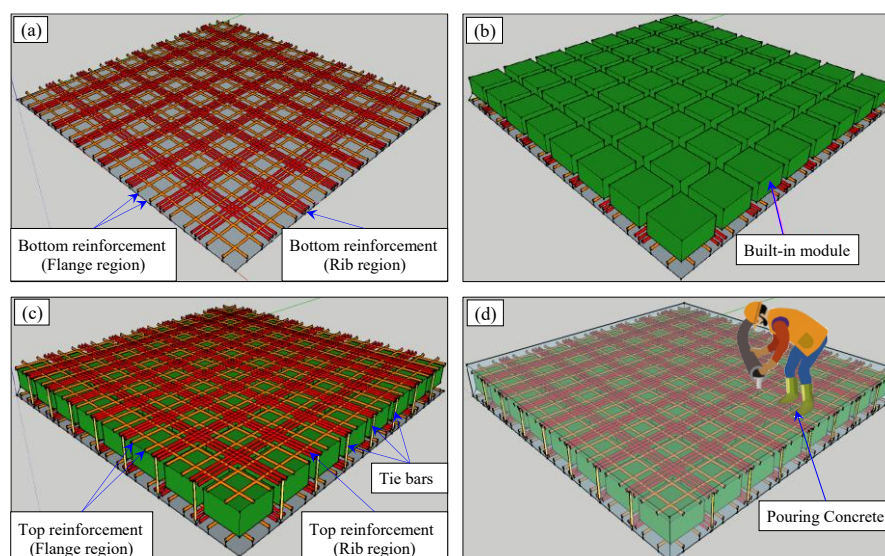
Construction process of slabs: (a) Tying bottom reinforcements, (b) Placing built-in modules, (c) Tying tie bars and top reinforcements, (d) Pouring concrete
